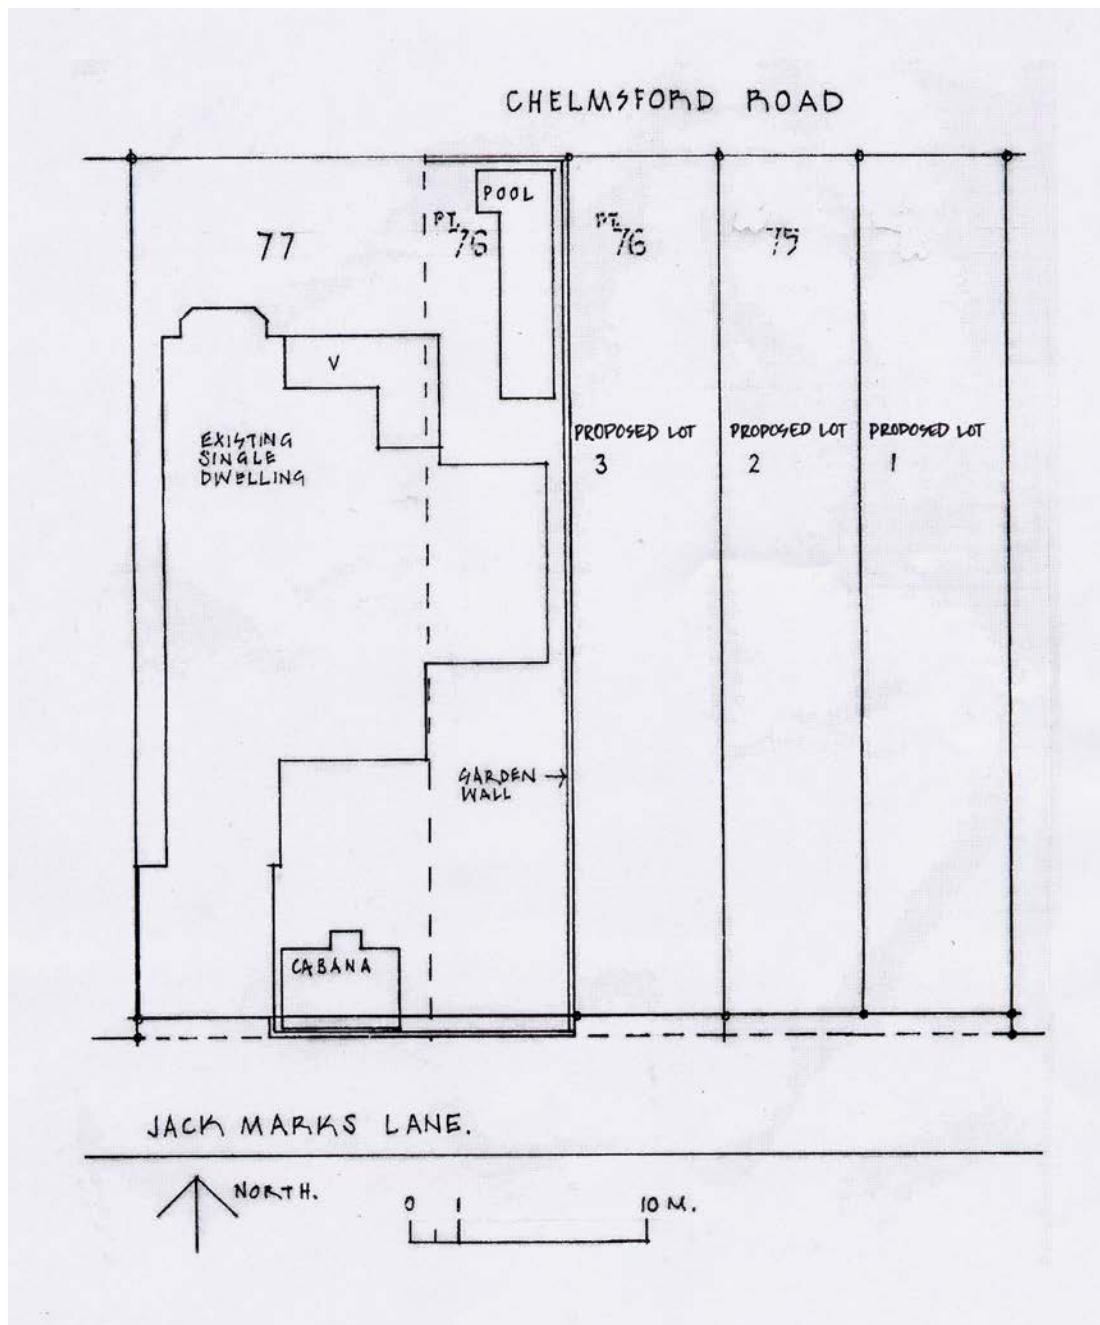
Diagrammatic Subdivision Plan of the Subject Land.
